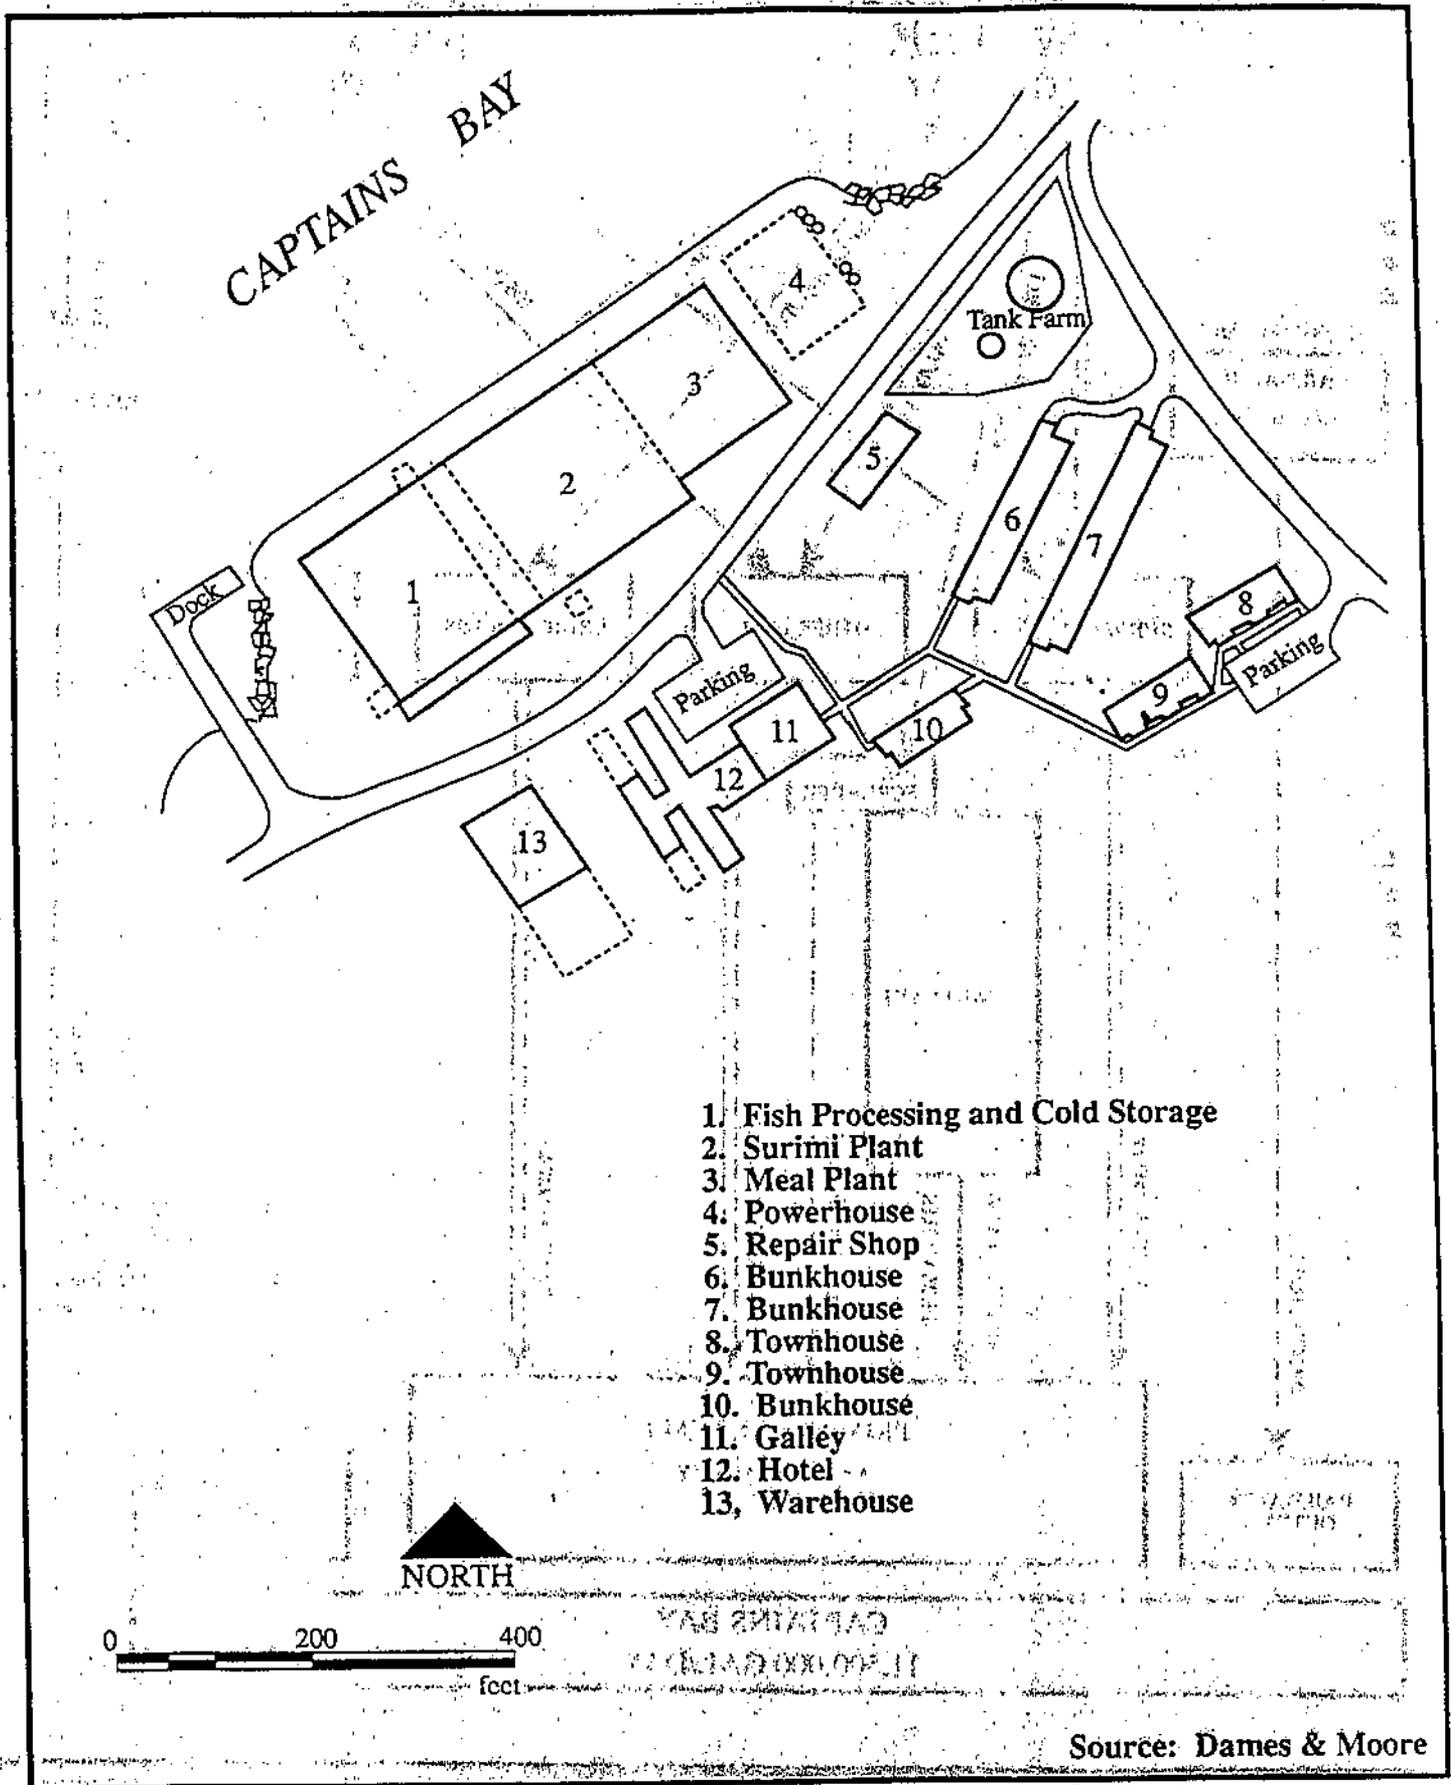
Site Plan for Proposed Westward Seafoods Facility
